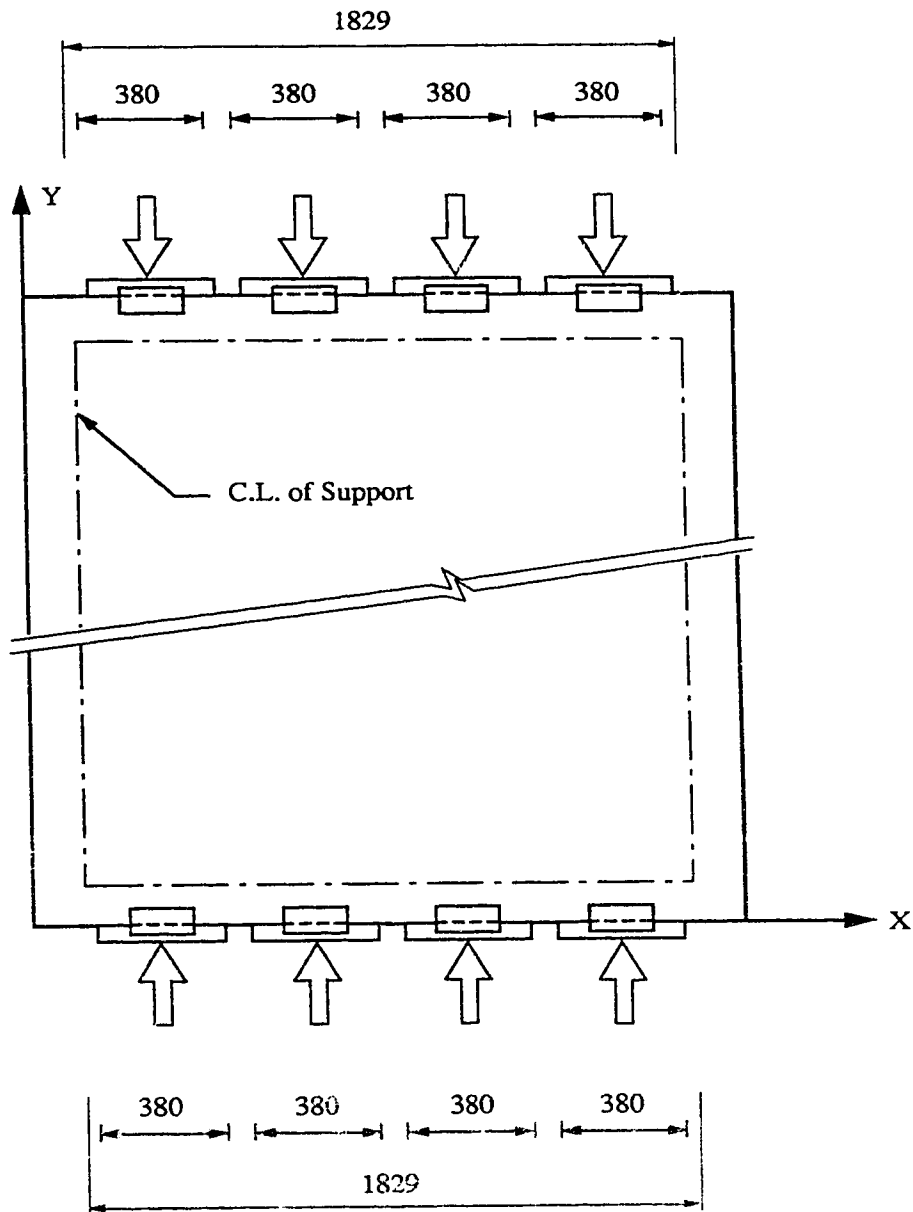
Arrangement of the Inplane Loading Plates for Specimens Loaded along the Short Sides
